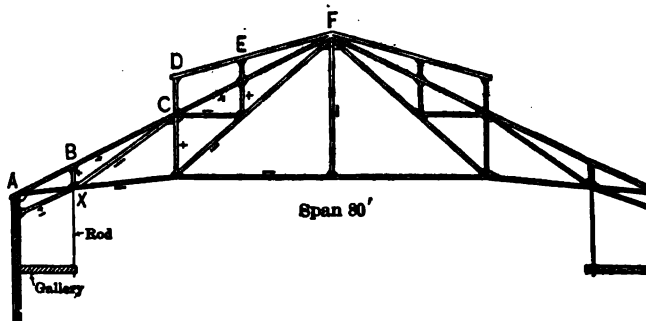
Fink Truss with Vertical Struts, for Drill-hall. Span Eighty Feet
